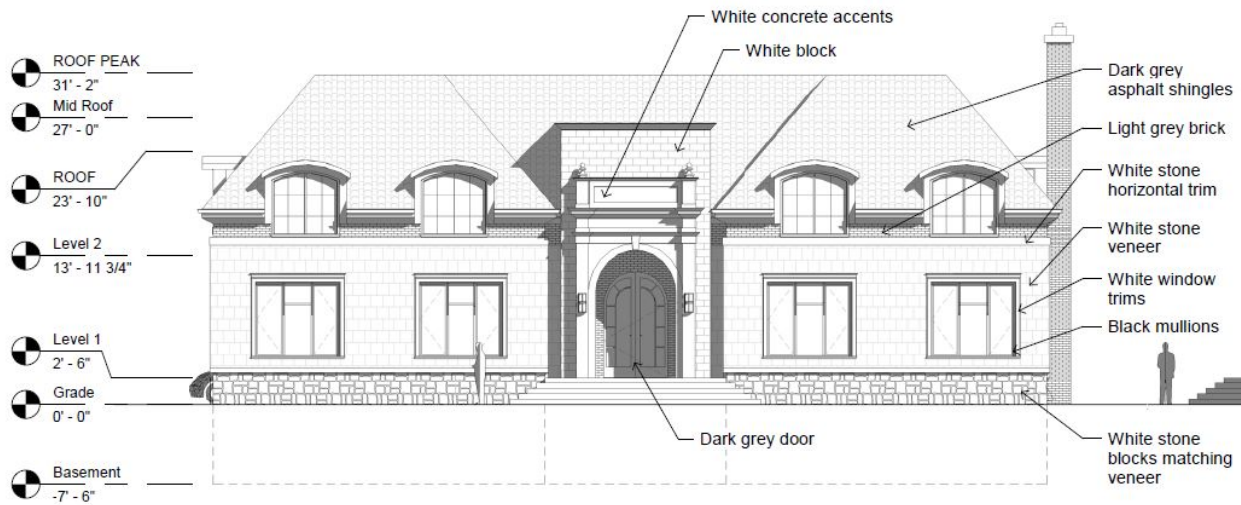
Front or west façade, 2230 Mississauga Road. (Image from client.)
